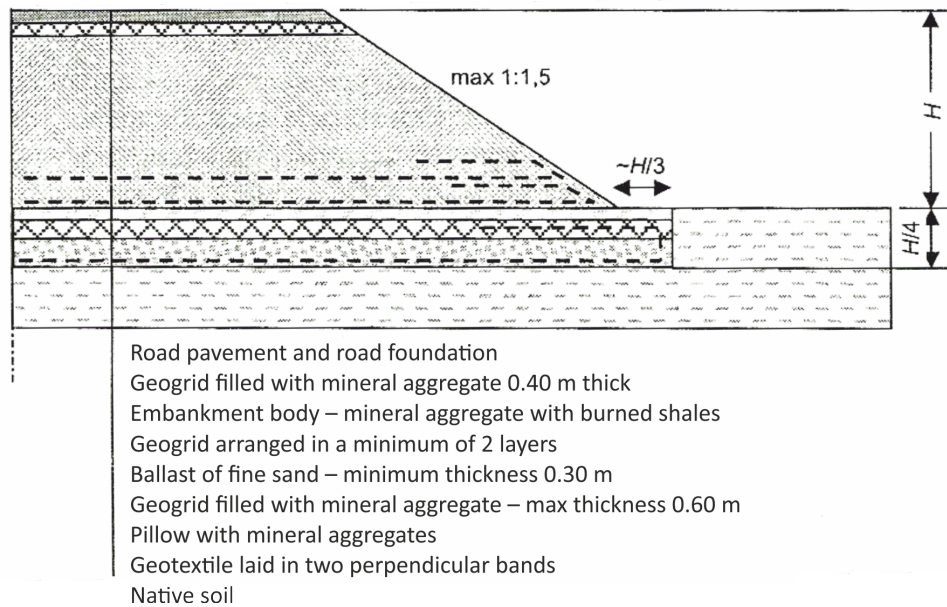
The system of soil and embankment body reinforcement located in mining areas.
